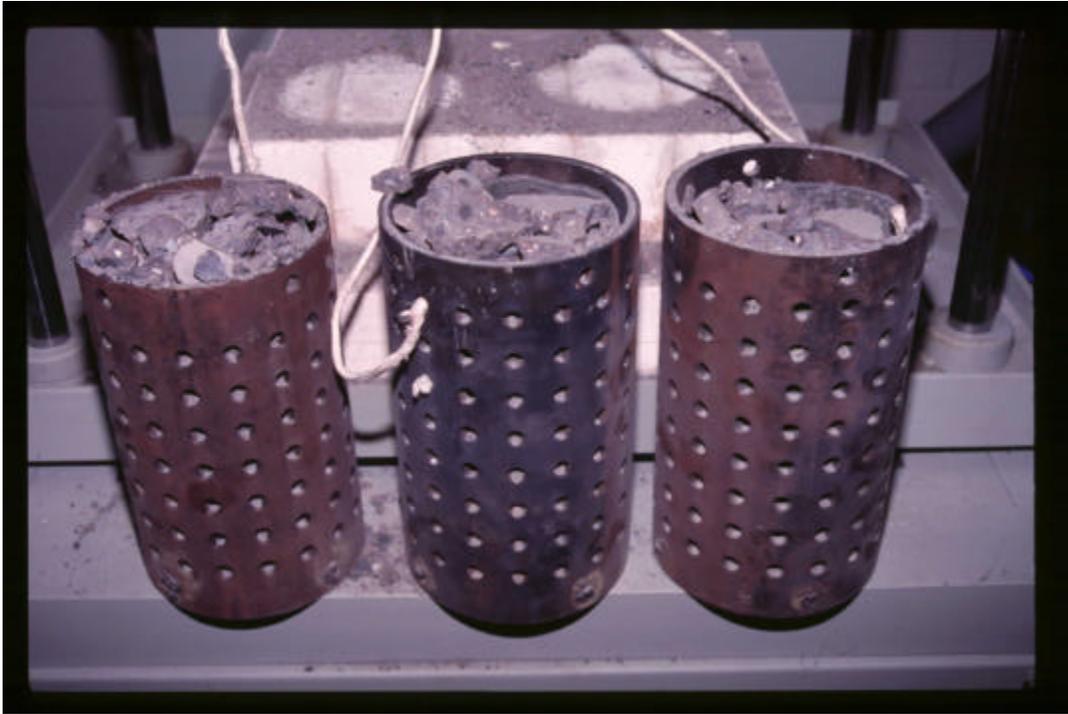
Explosively spalled Mixture I test specimens.
